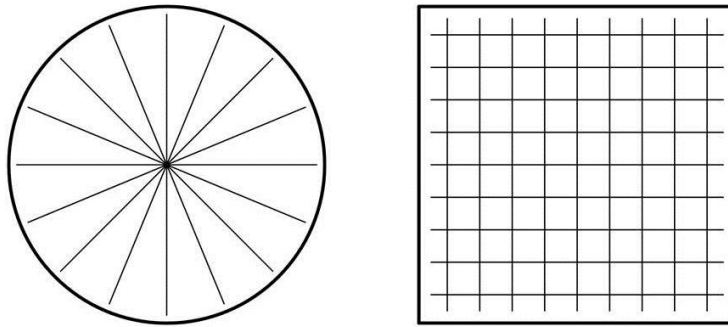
Common placement of reinforcement in an onsite cast foundation, a) placed radially in a circular foundation, b) placed parallel to the sides in a square foundation.
